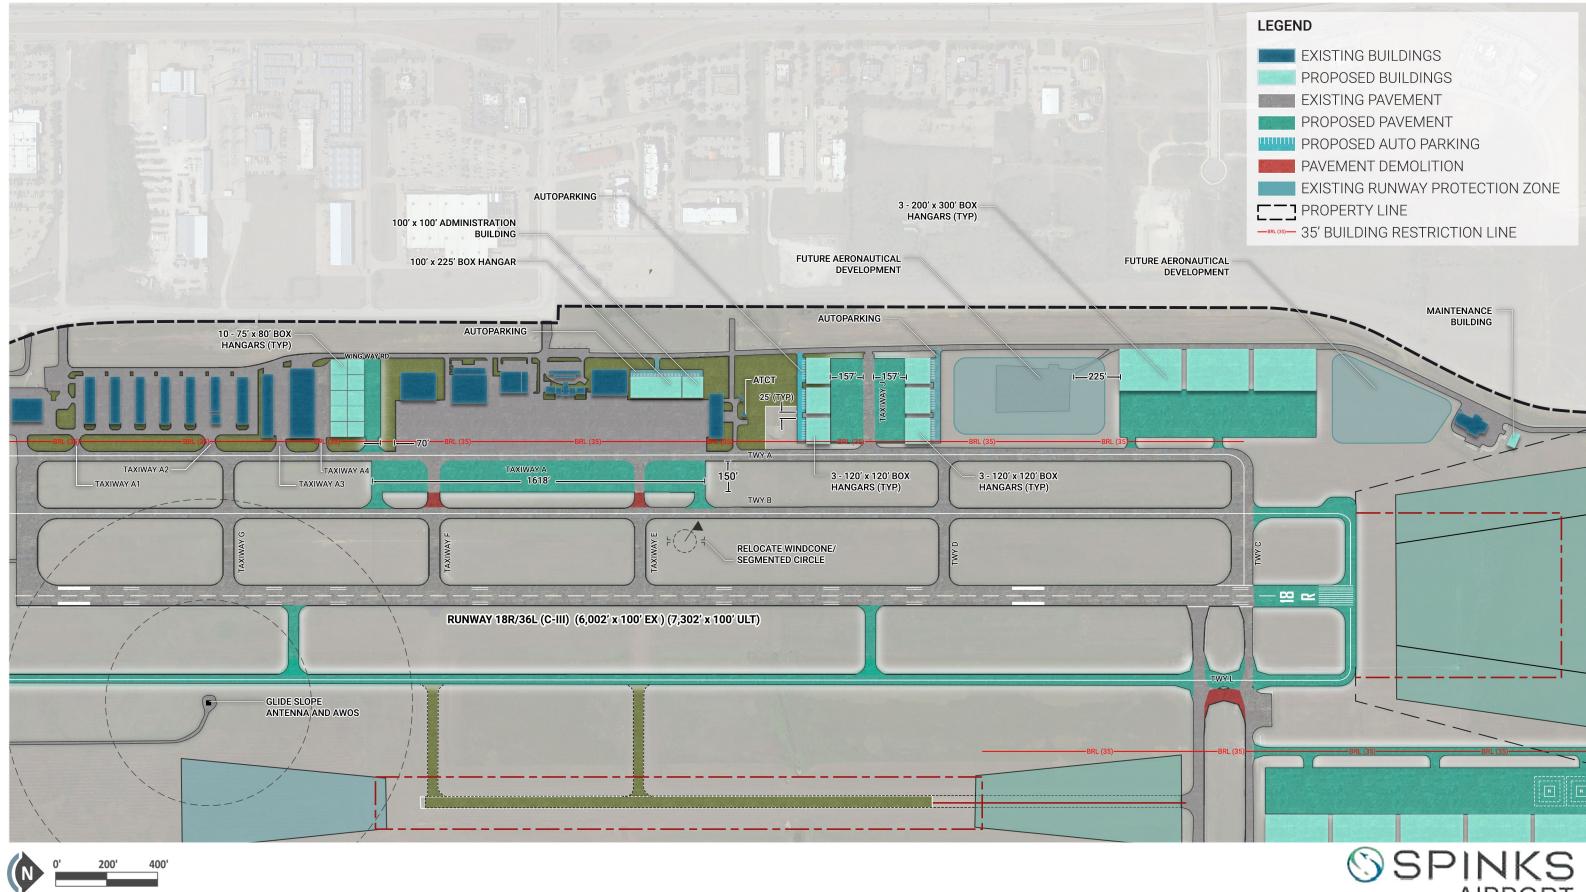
RECOMMENDED PLAN (AIRSIDE)
